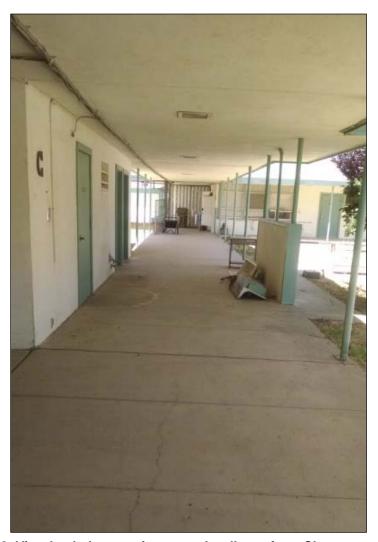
View back down main covered walkway from Classroom Building C toward Building A.
